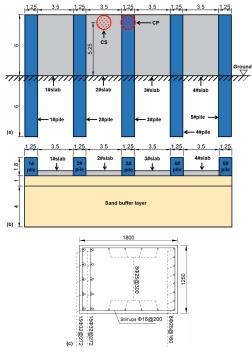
The design diagram of PSRW (a) front view (unit: m) (b) top view (unit: m) (c) cross-section profile of pile (unit: mm).
